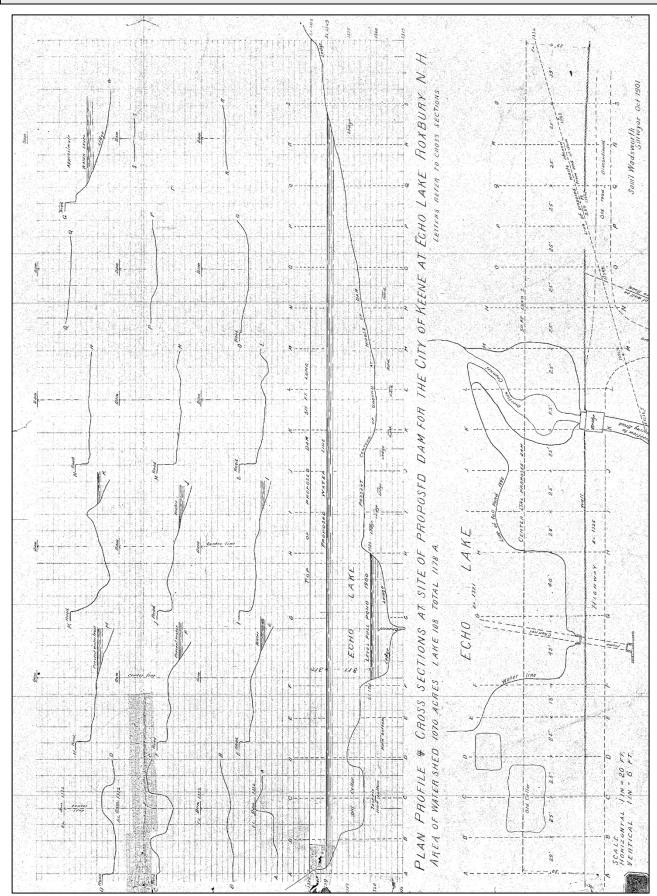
Plan showing then existing dam at Echo Lake (Source: Wadsworth 1901).
